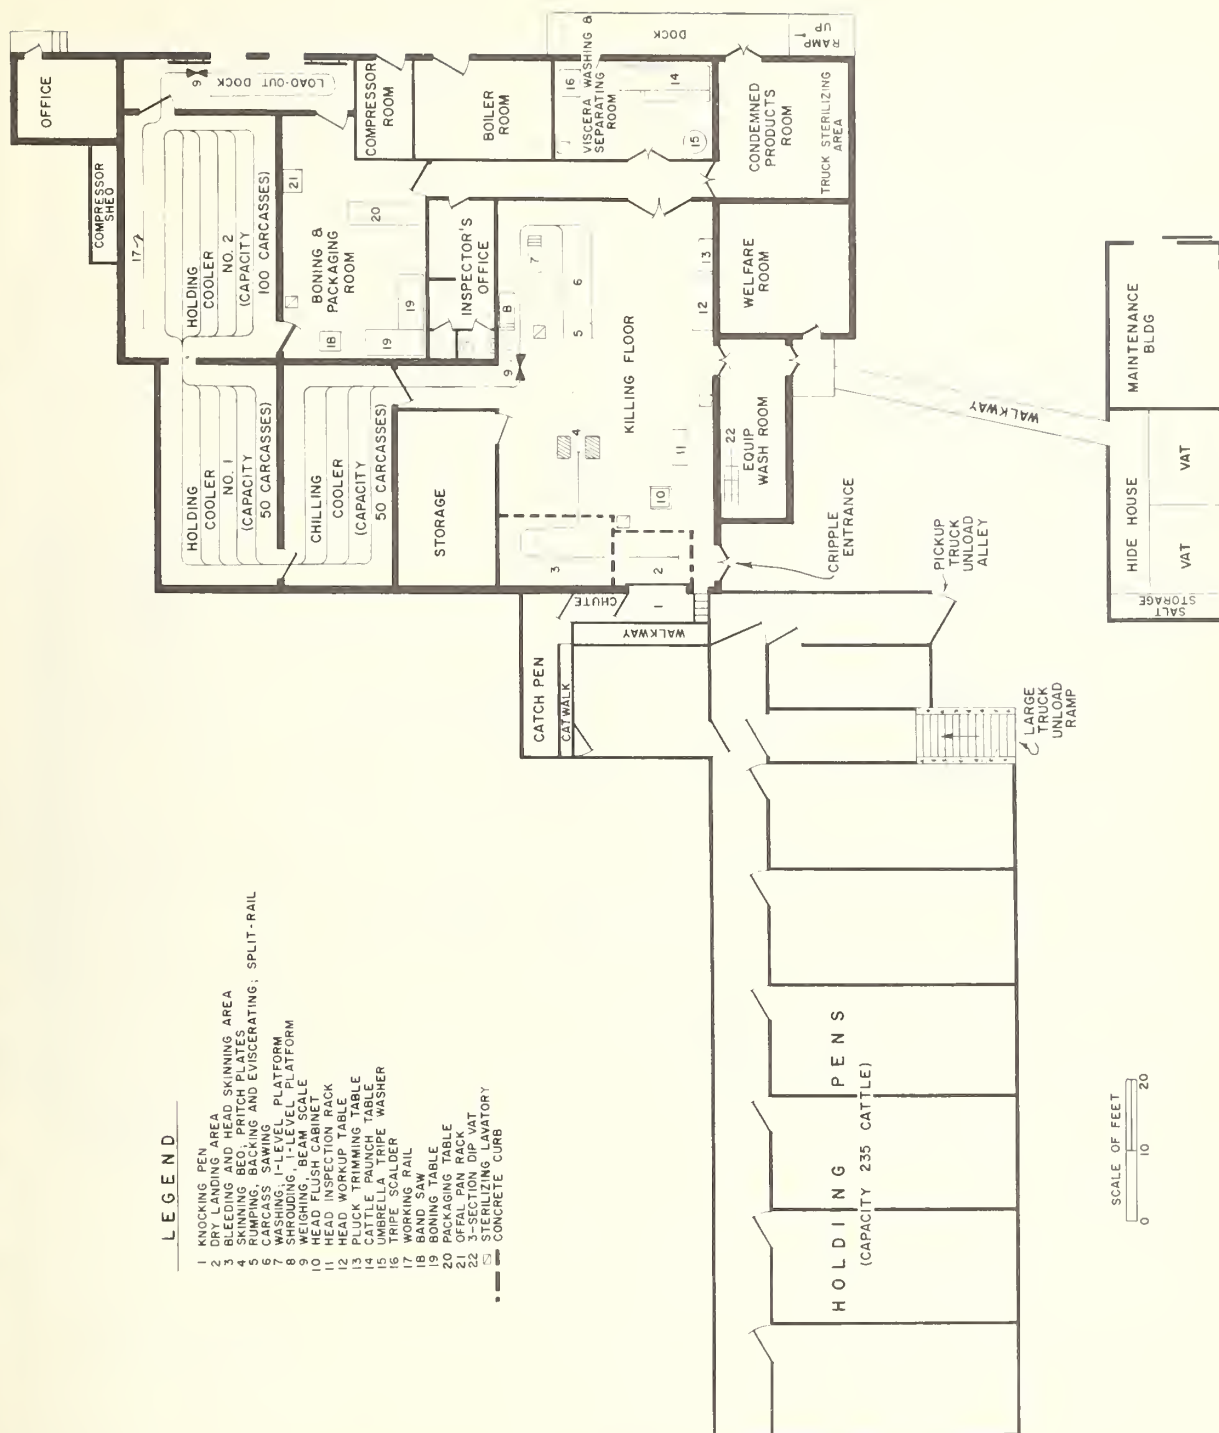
Layout of a typical plant slaughtering 100 cattle daily.
